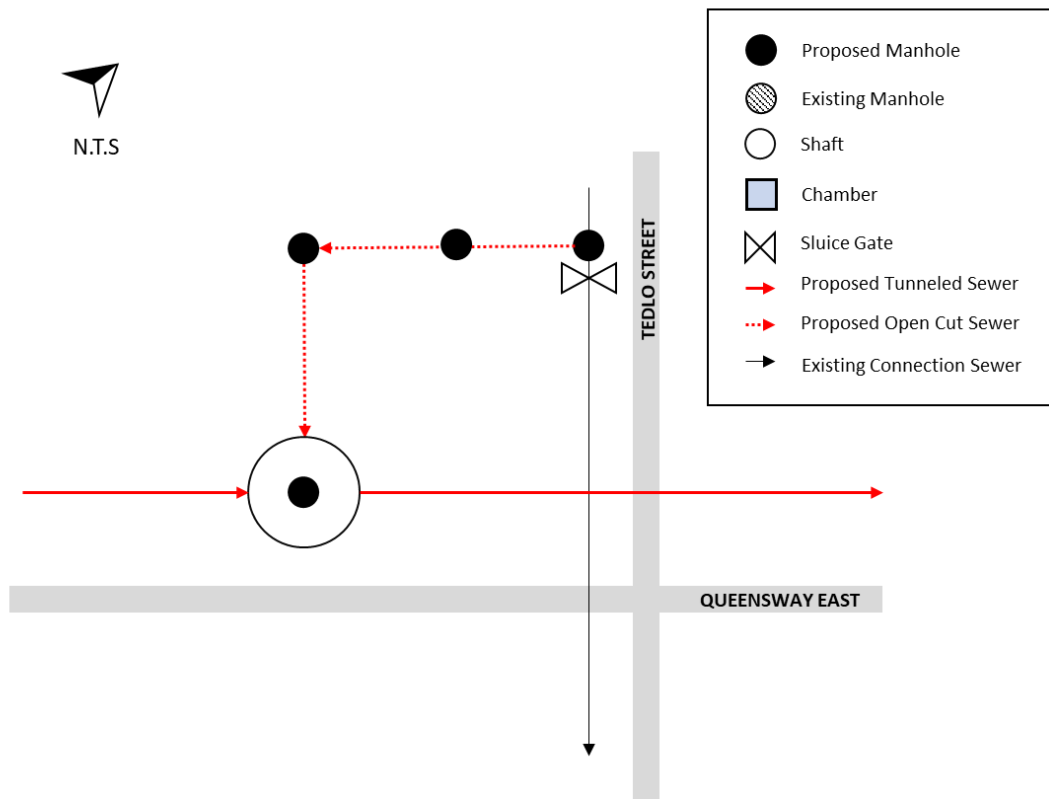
Queensway East and Tedlo Street Connection Type Schematic
